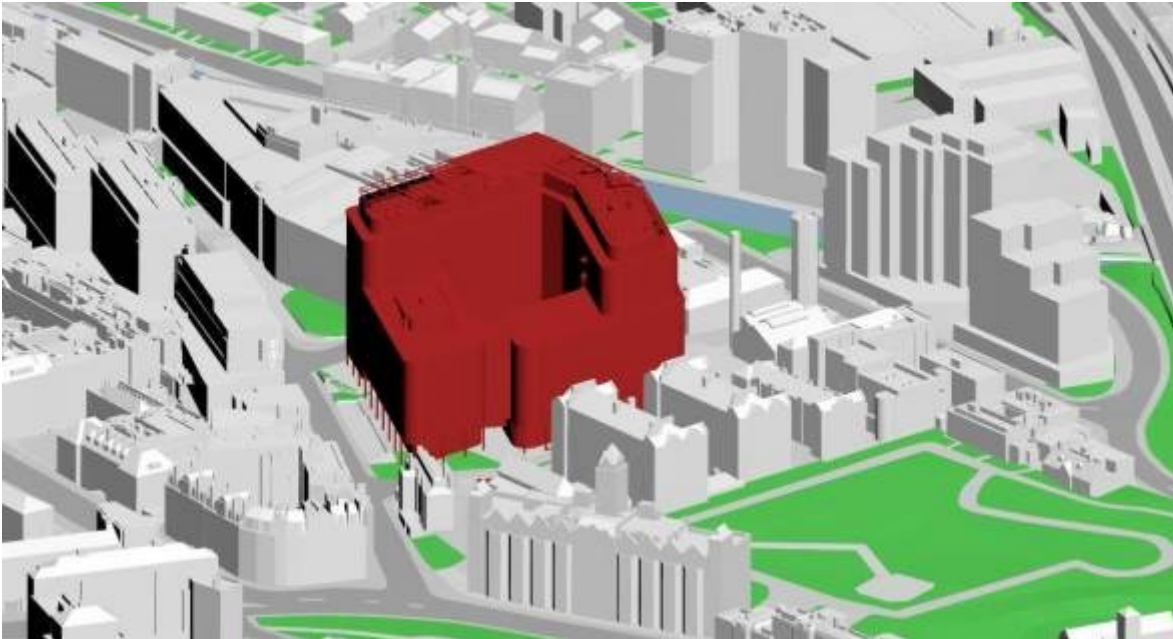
3D model of proposed massing showing relationship to surrounding buildings
